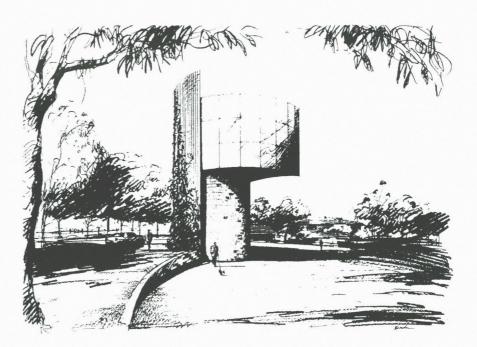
ARTIST'S IMPRESSION OF TUNNEL EXHAUST VENT STACK AT ARNCLIFFE STREET
